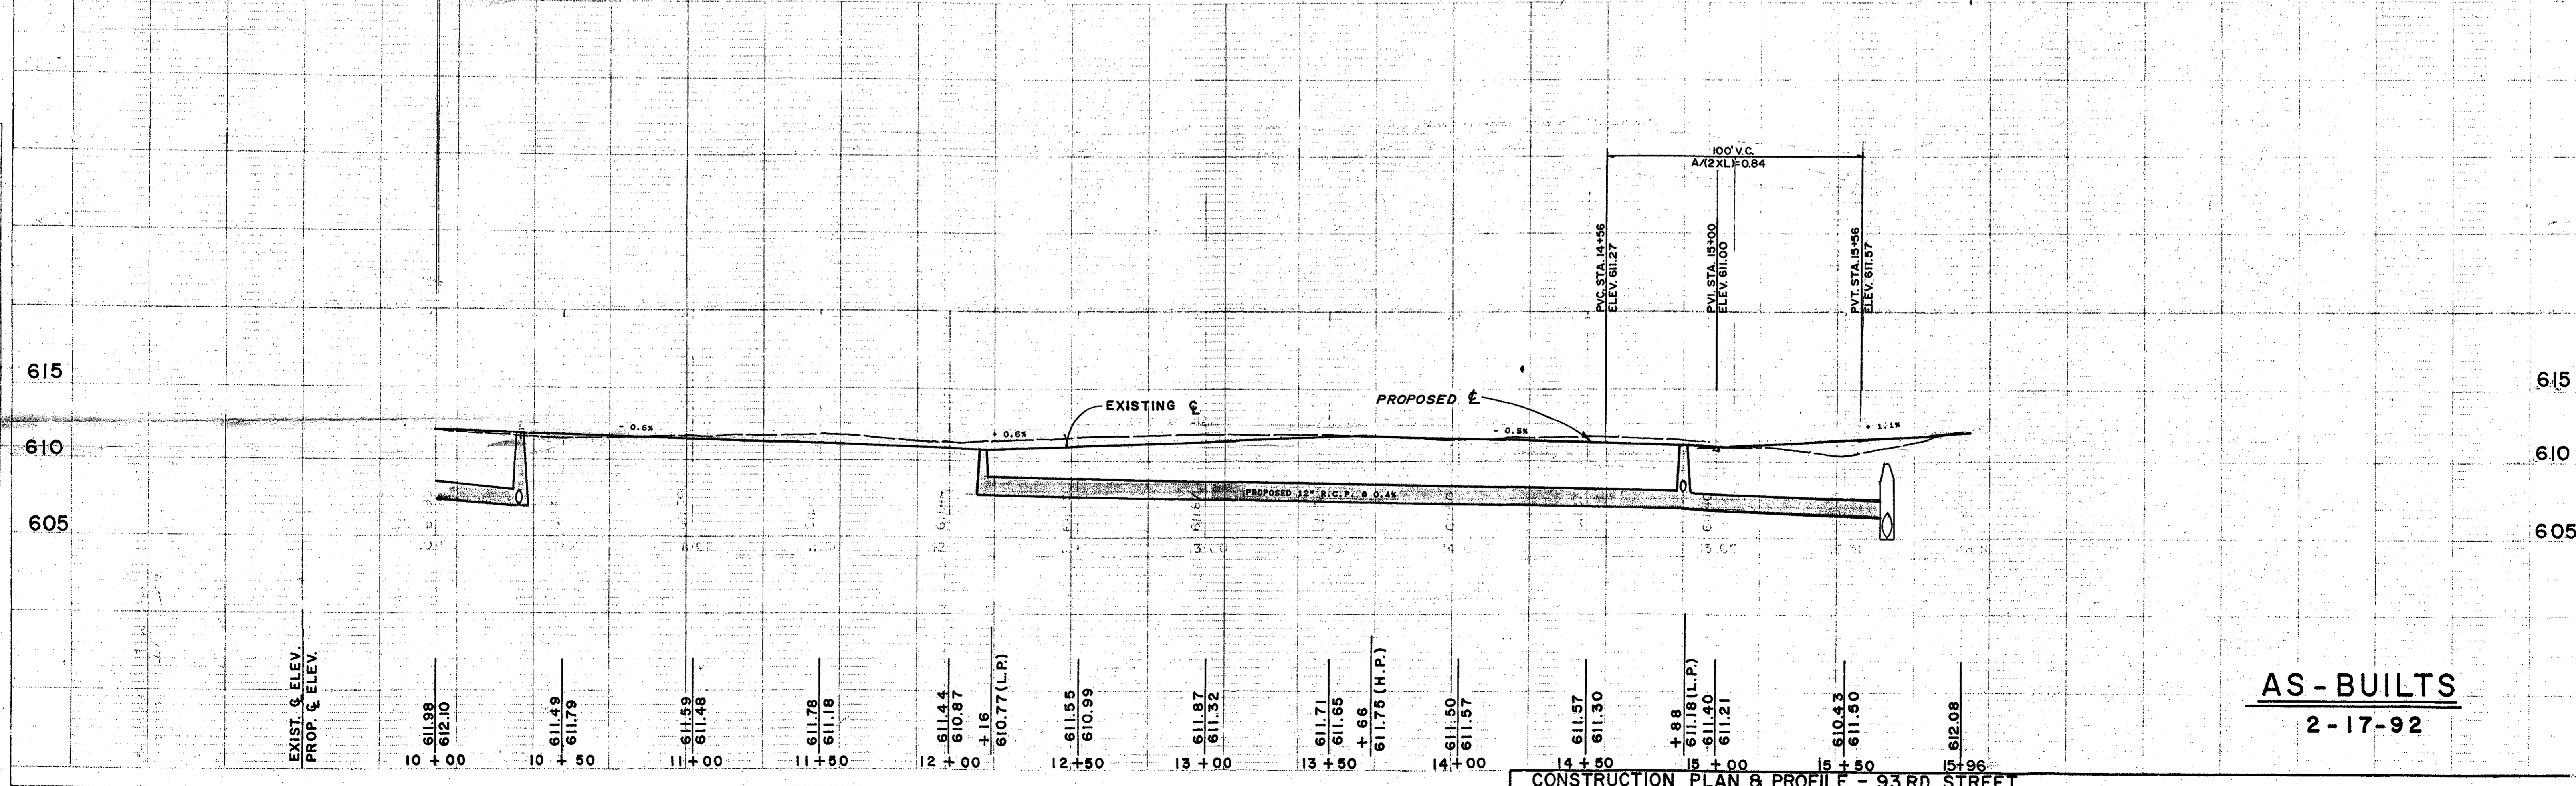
SINGLE PLAN AND PROFILE LINE & DOT
